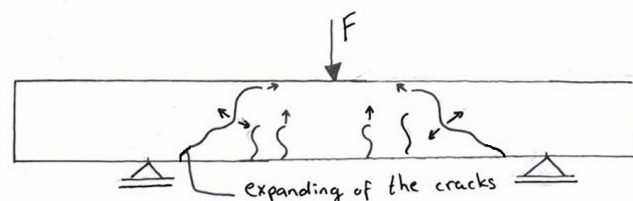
Failure of the beam due to opening and widening of the cracks.
